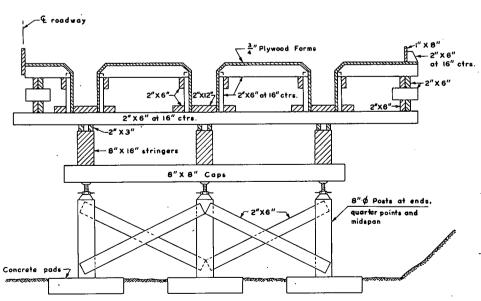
Forms and falsework for reinforced concrete beam bridges.
